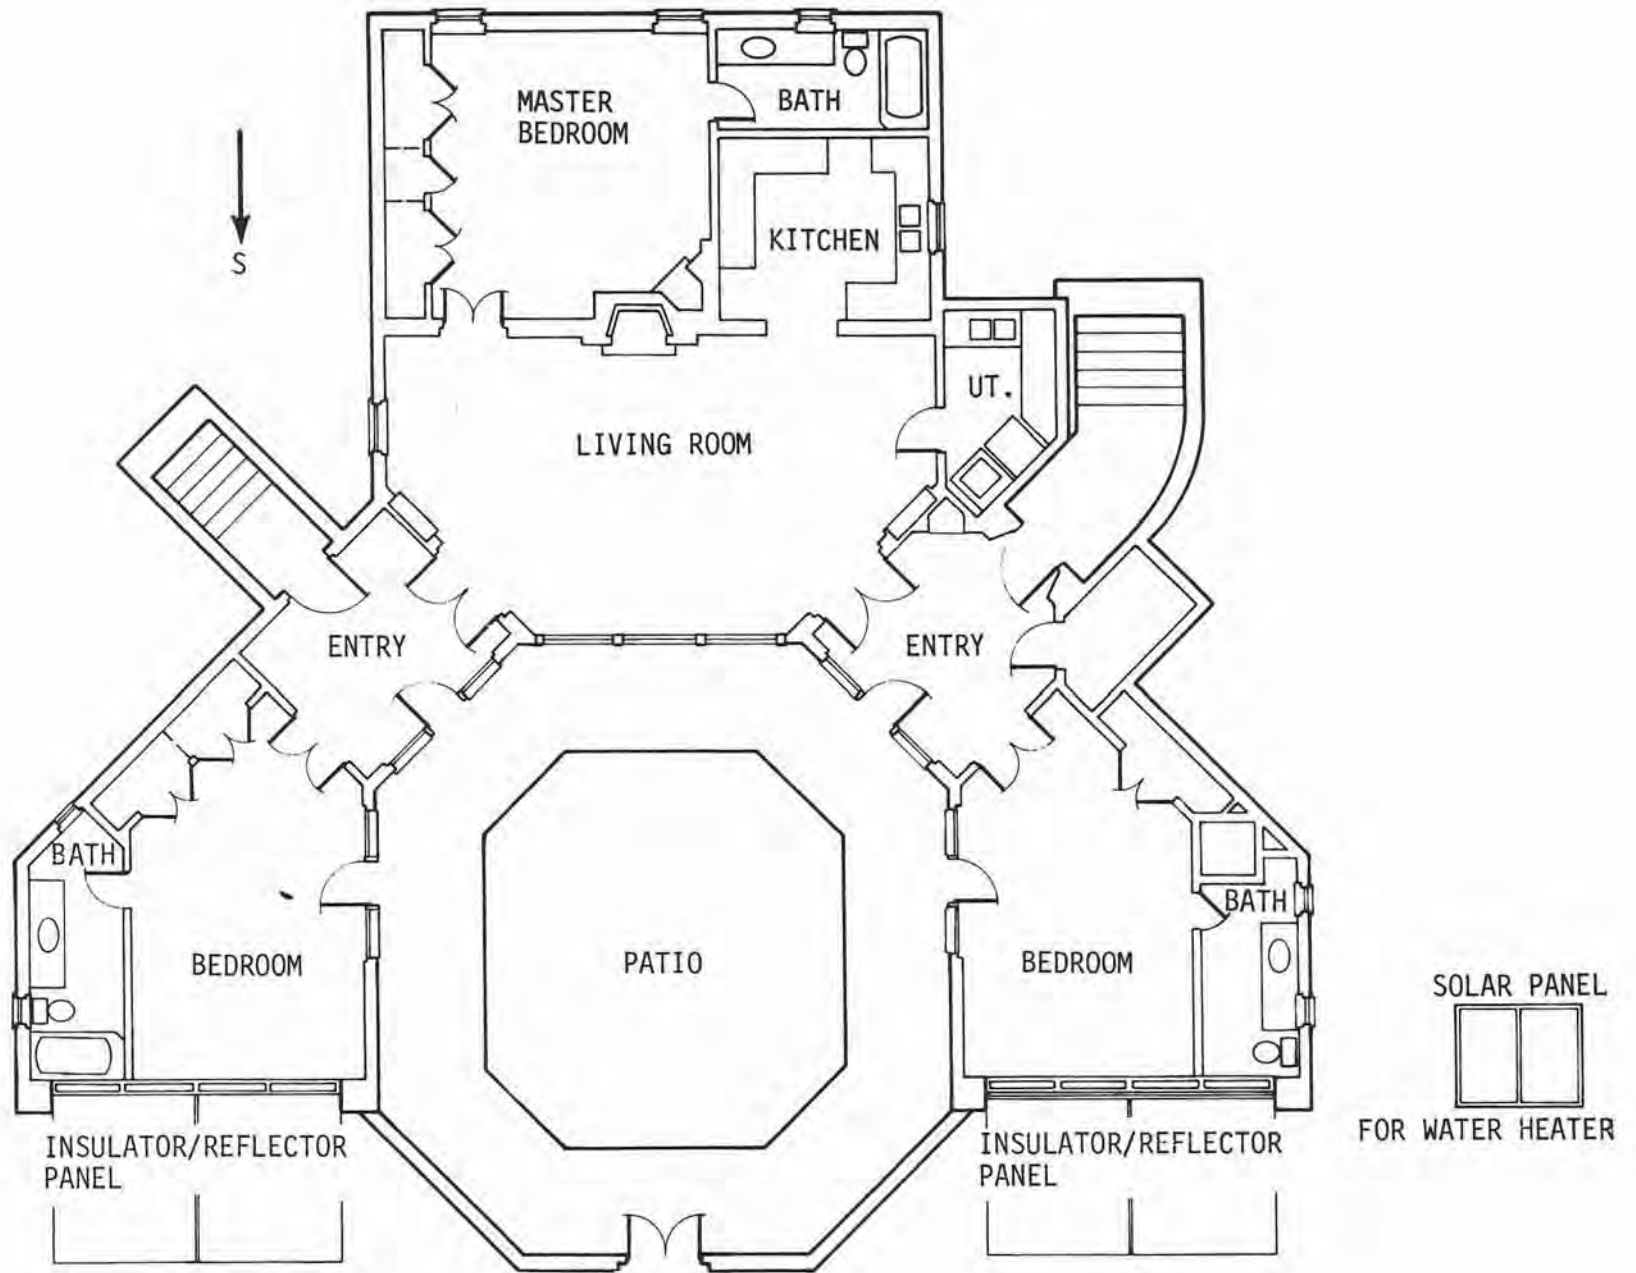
Floor Plan of Unit 4, First Village (the Gunderson House)
